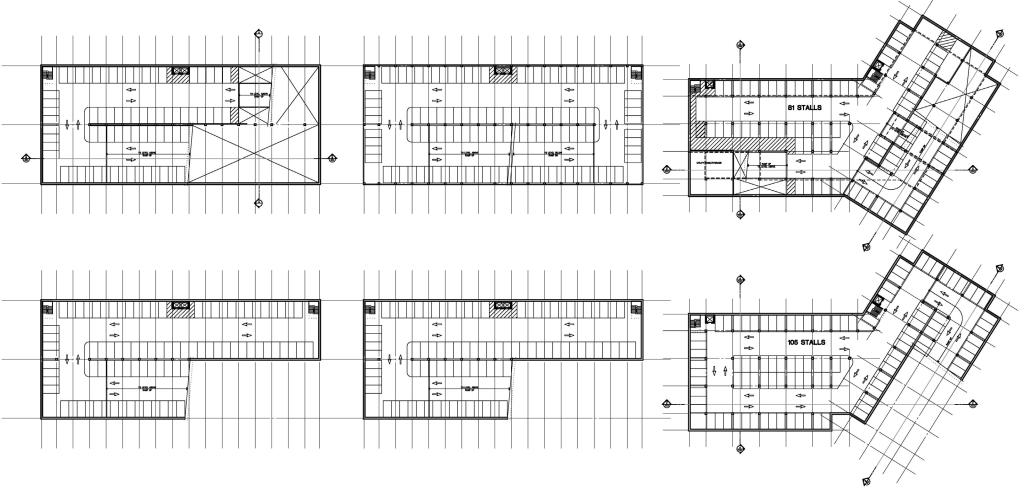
Public Private Test Case B— Below-Grade Parking Layout – Three Separate Parking Structures, Plazas 1, 2 and 3
